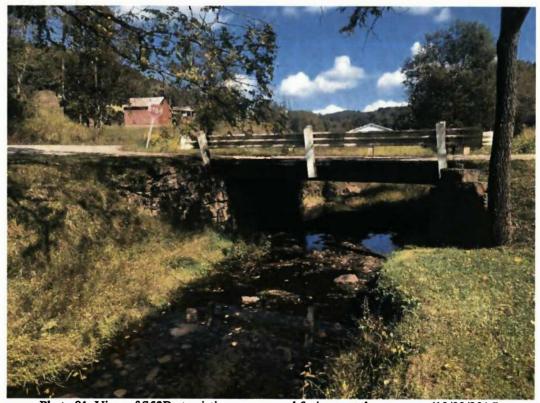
View of S52B at existing access road facing east downstream (10/03/2016)
